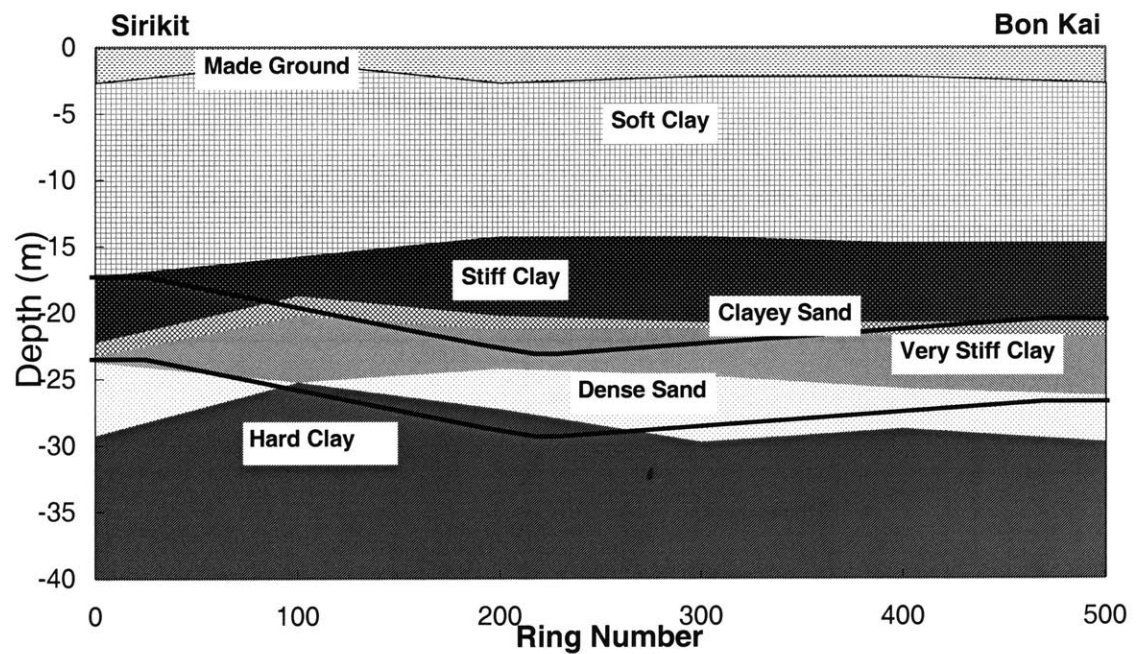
Subsurface conditions of tunneling section (southbound) between Sirikit and Bon Kai stations (Section D)
